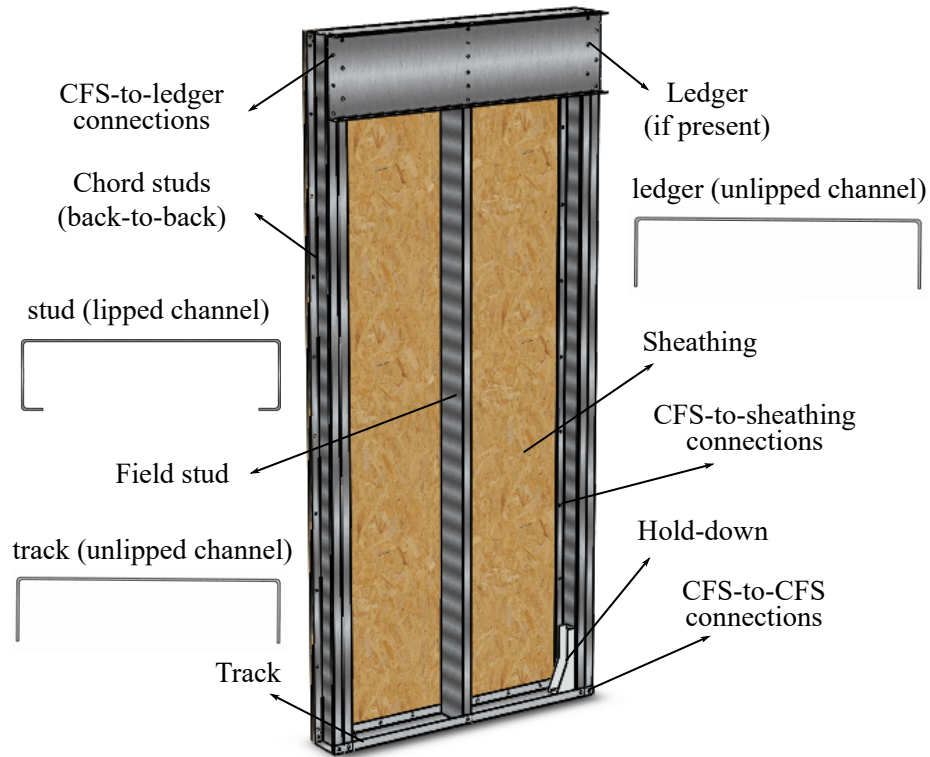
Typical sheathed cold-formed steel (CFS) shear wall configuration and details. CFS studs (lipped channels) and CFS tracks (unlipped channels) represent the wall structural frame connected to sheathing panels in the exterior side, and connected to the foundation by hold-downs. Construction details, such as ledger track and/or vertical seam, might be present.
